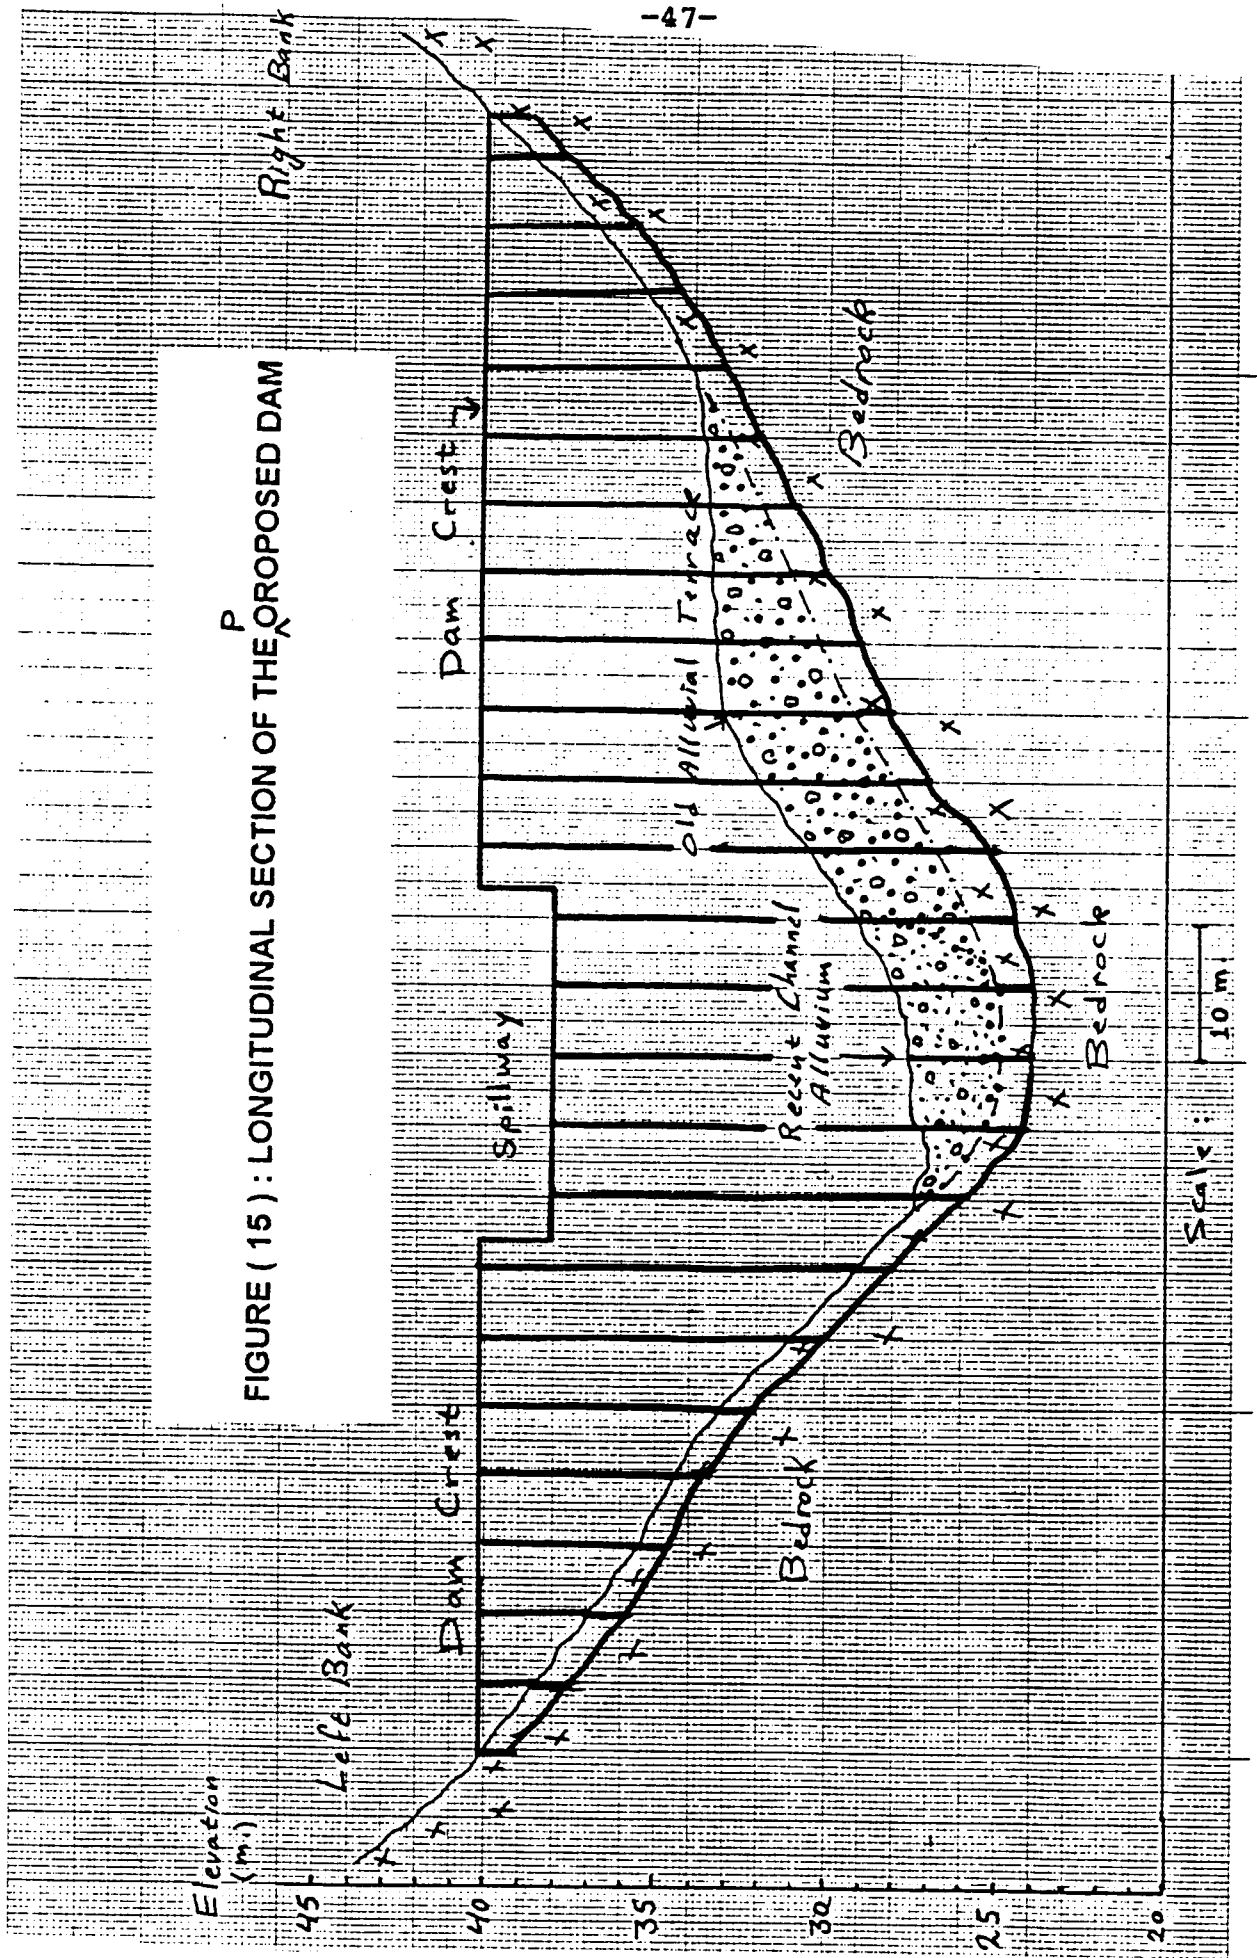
LONGITUDINAL SECTION OF THE PROPOSED DAM
